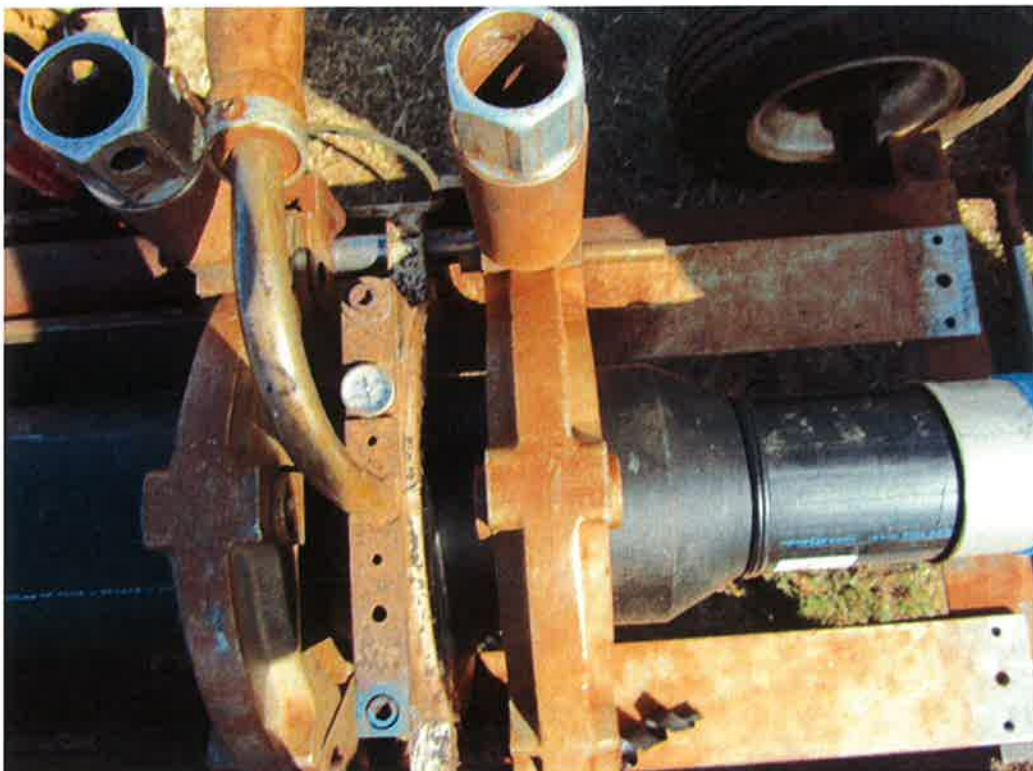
HDPE fusion welding for Wet Well #2 components.
